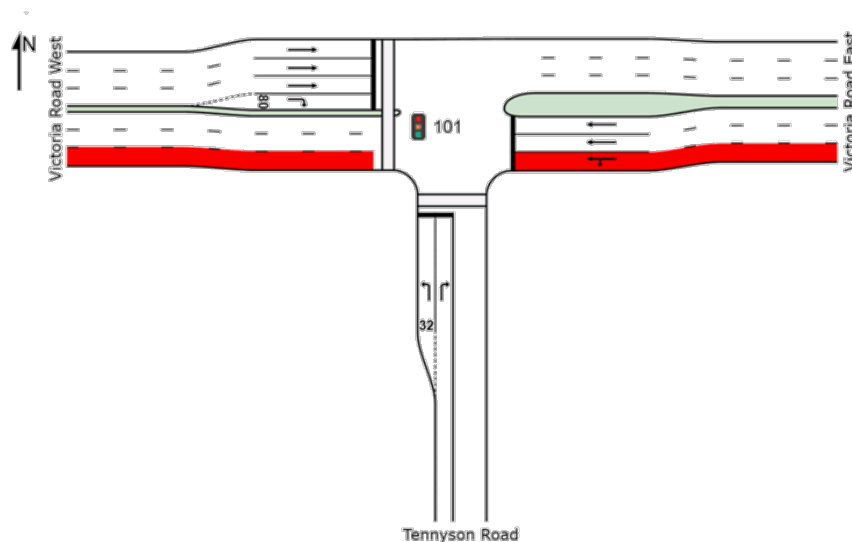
Tennyson Road/Victoria Road Existing Intersection
